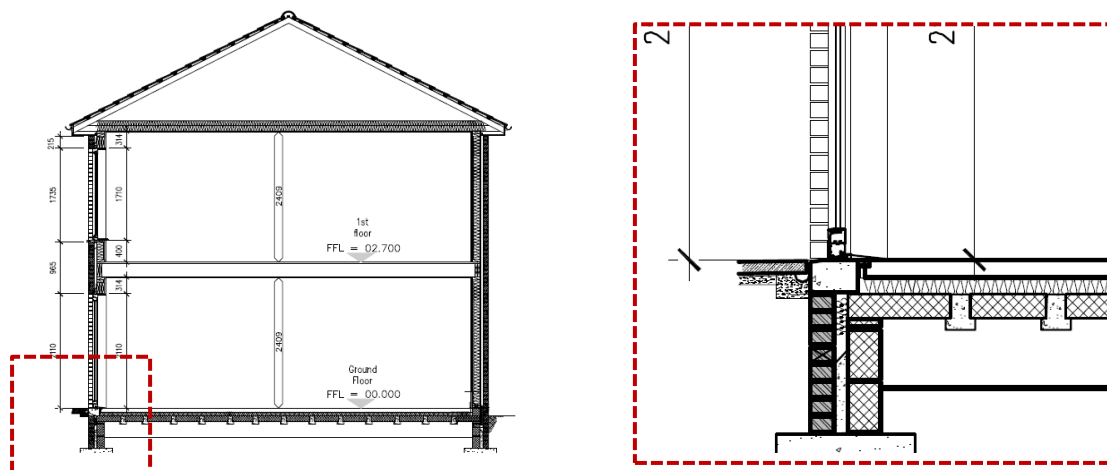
Section and floor detail. Door and window thresholds are not insulated and section shows no thermal barrier resulting in cold bridges as shown in Figure 16. It is recommended that threshold details are reconsidered for future developments.
